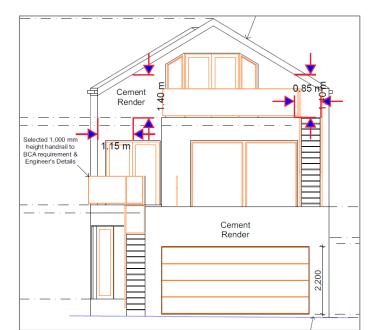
Rear elevation showing depth of height under 1.4m (Source: Benyana Building Design, overlay by Council)
